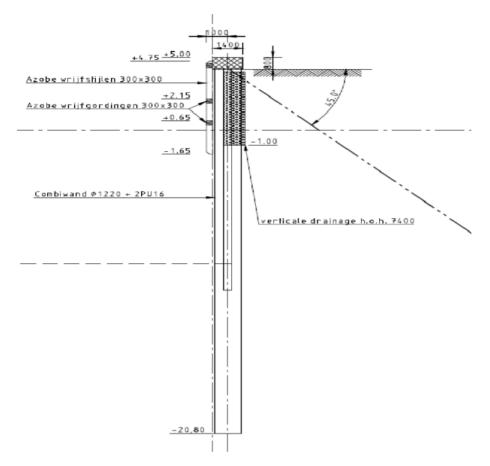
Cross section quay wall structure 2e Petroleumhaven
